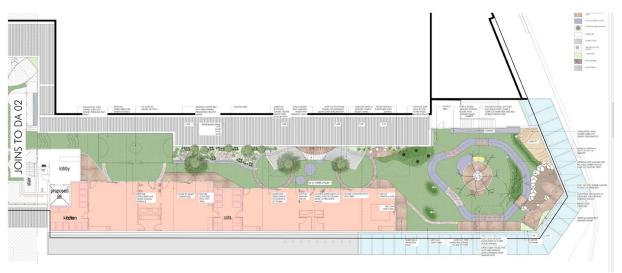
Proposed first floor childcare centre landscape plan - Northern section
